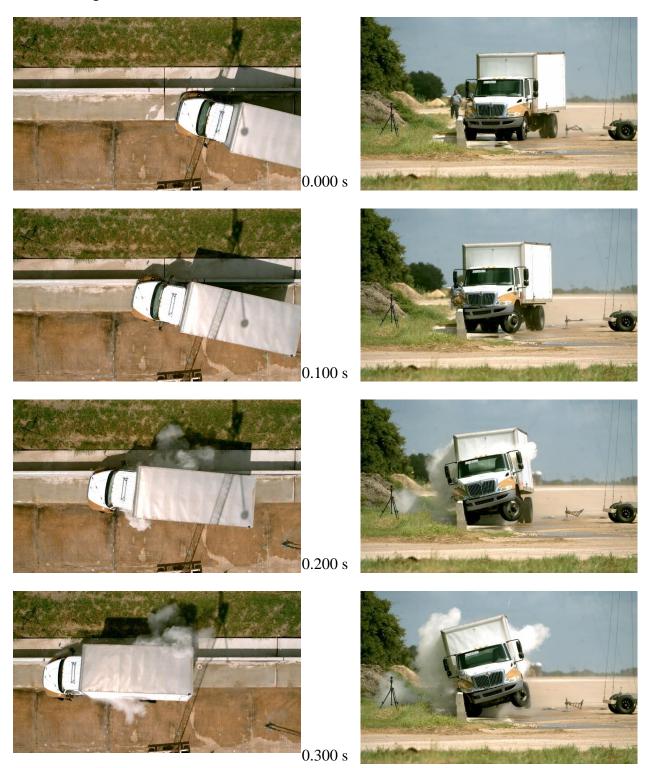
Sequential Photographs for Test No. 469680-02-2 (Overhead and Frontal Views).
